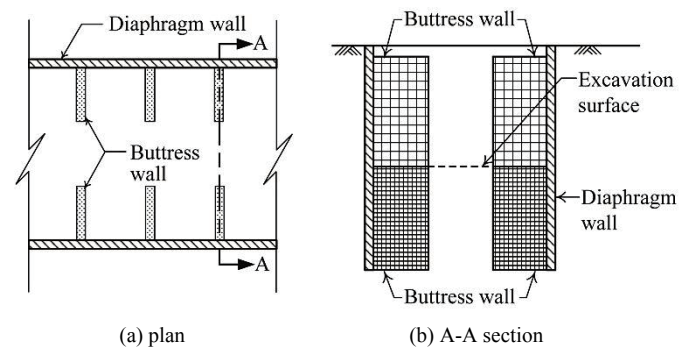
Schematic diagram of buttress wall (a) plan (b) A-A section
